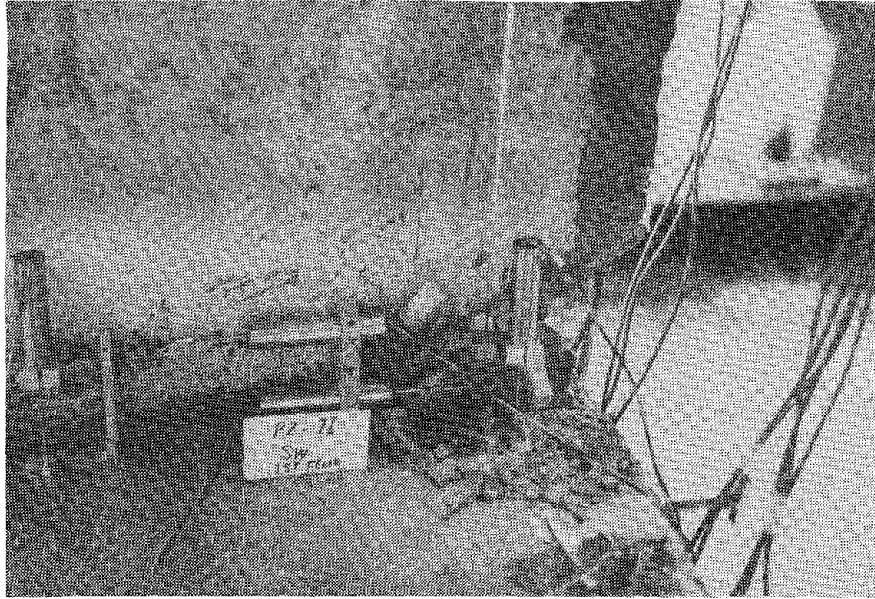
First floor joint of simple wall (PZ-I) after EC-500, 0.67g.
